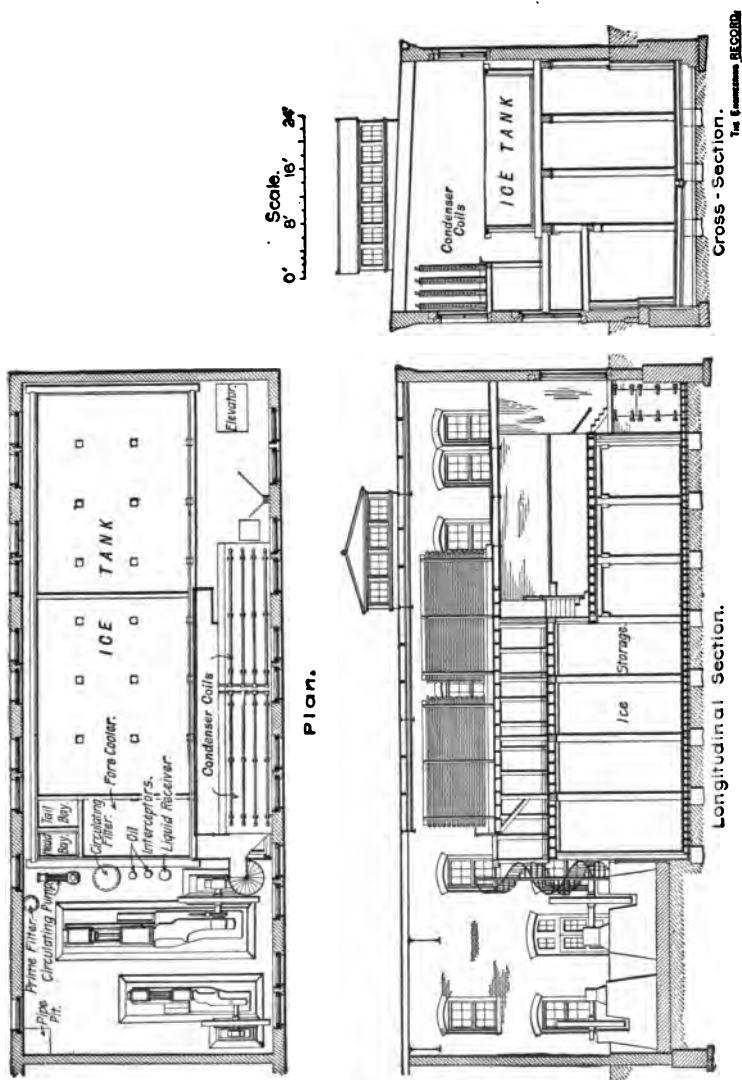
GENERAL ARRANGEMENT OF ICE PLANT.
